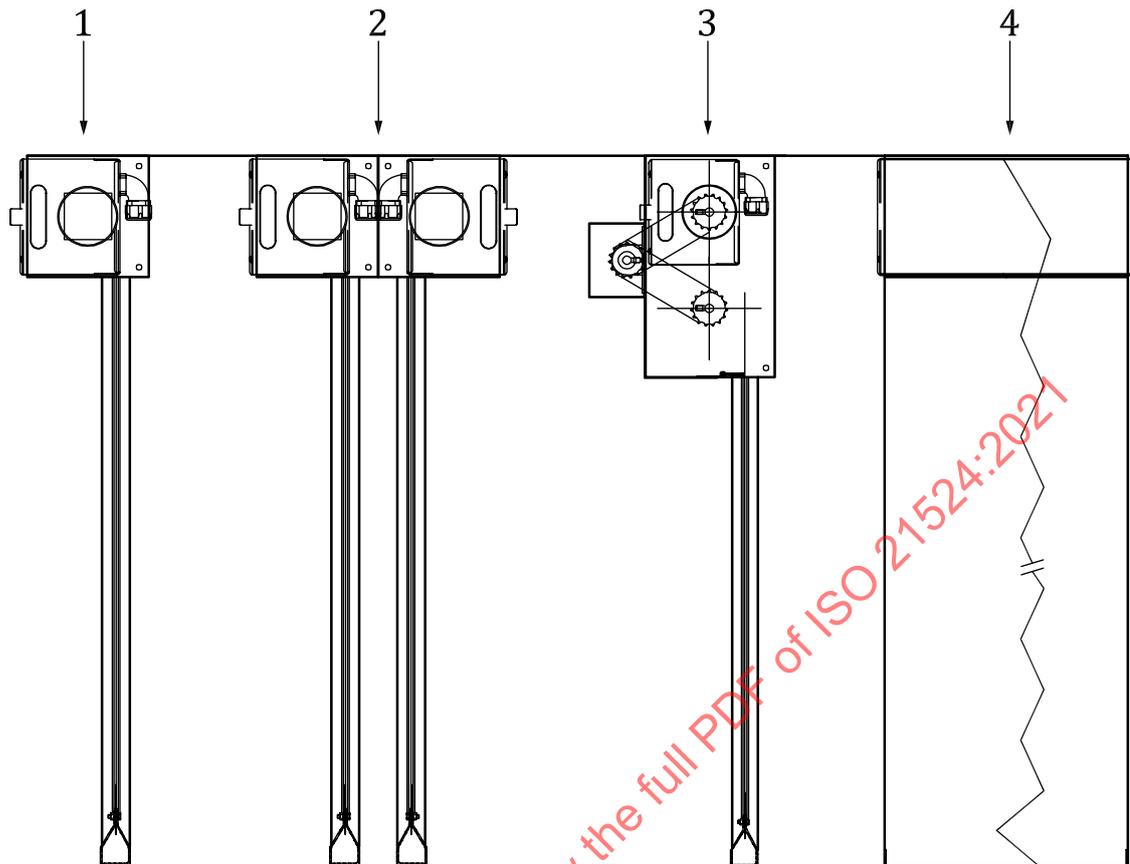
(#) illustrates examples of typical active fire curtains arrangements.
